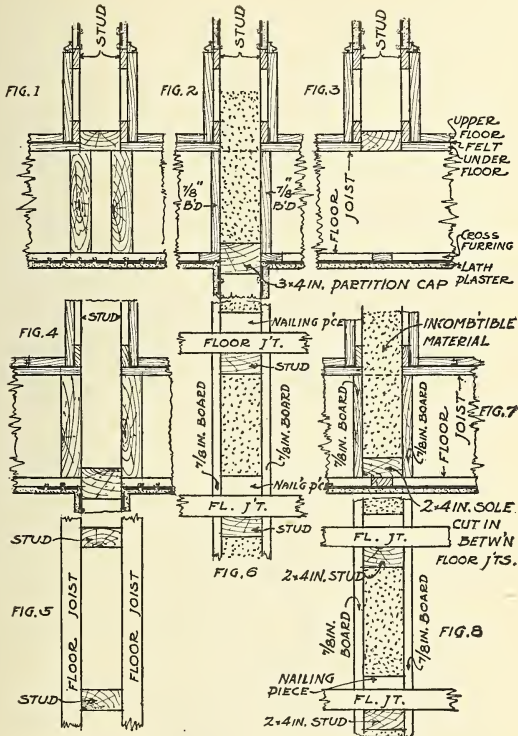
Interior partition running same direction as floor joists supported on double joists, fire-stopped at bottom by 2 by 4 inch sole.
